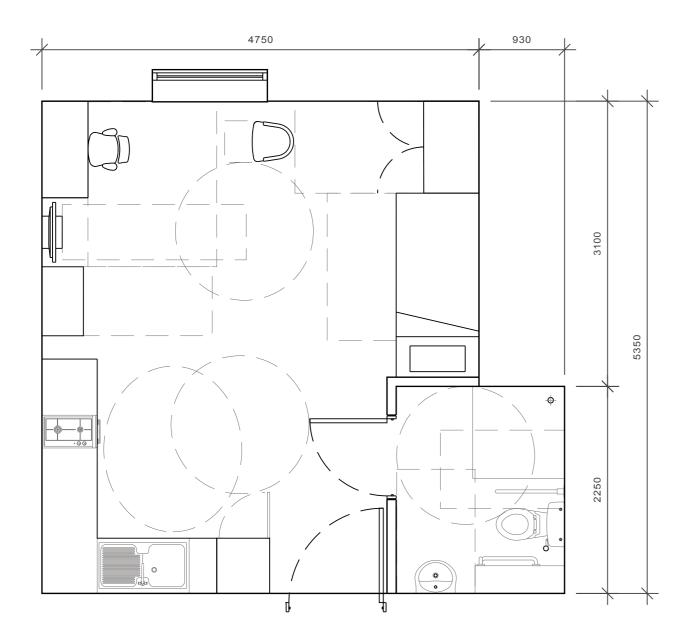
ACCESSIBLE STUDIO WITH PRIVATE KITCHEN, DESK, BED AND STORAGE
